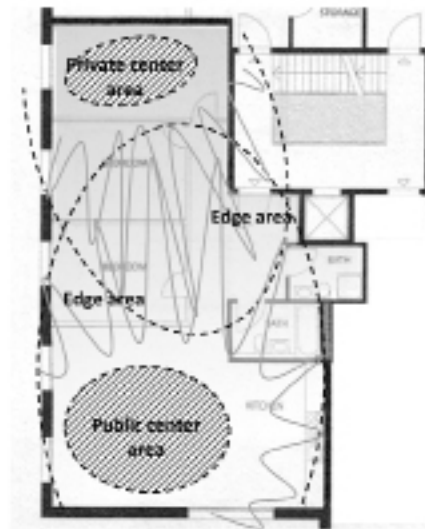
Formation of Center and Edge in a Contemporary House Plan (Schneider and Till, 2007)
